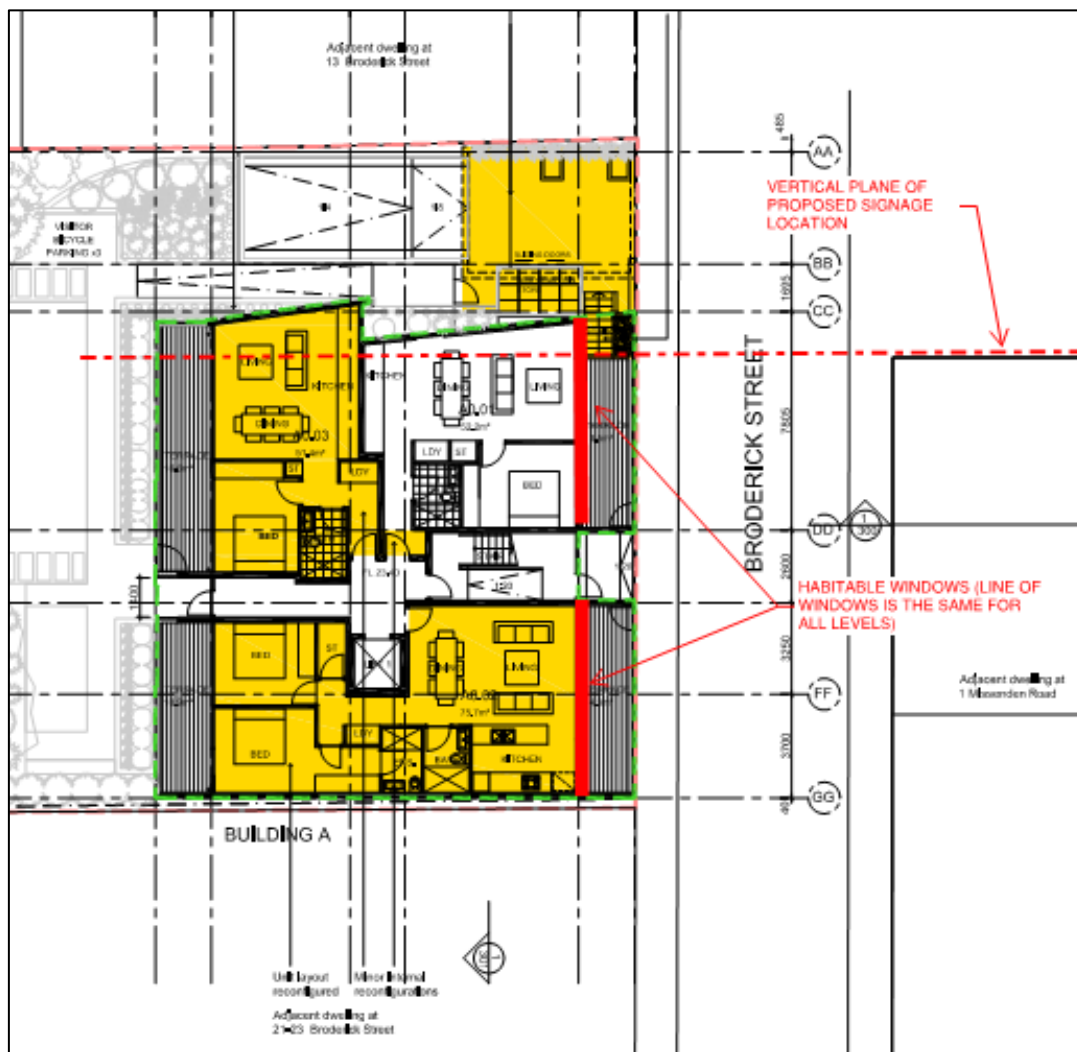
Extract of Plans of new approved development at 12 Marsden St showing the habitable windows on the Brodrick St façade in relation to the vertical plane of the proposed signage.
